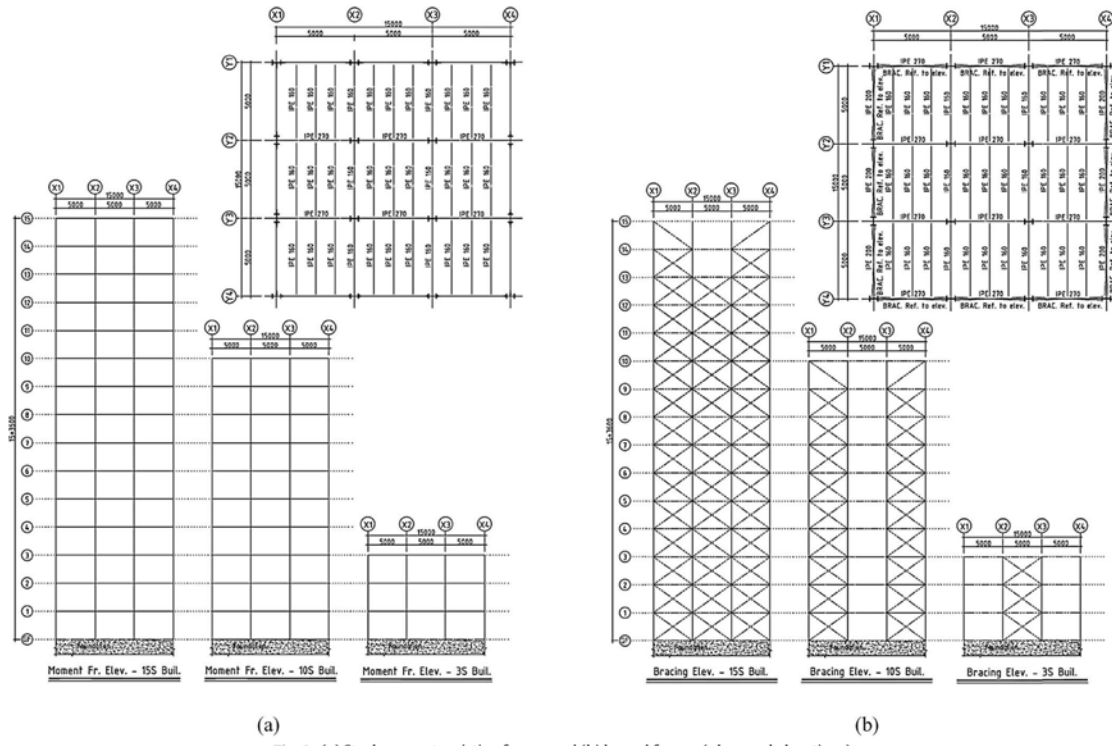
(a) Steel moment resisting frames and (b) braced frames (plans and elevations).
